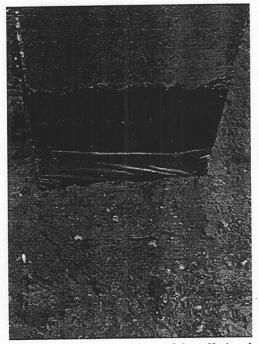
Separation of the pile/seal slab interface after failure for a concrete specimen.
